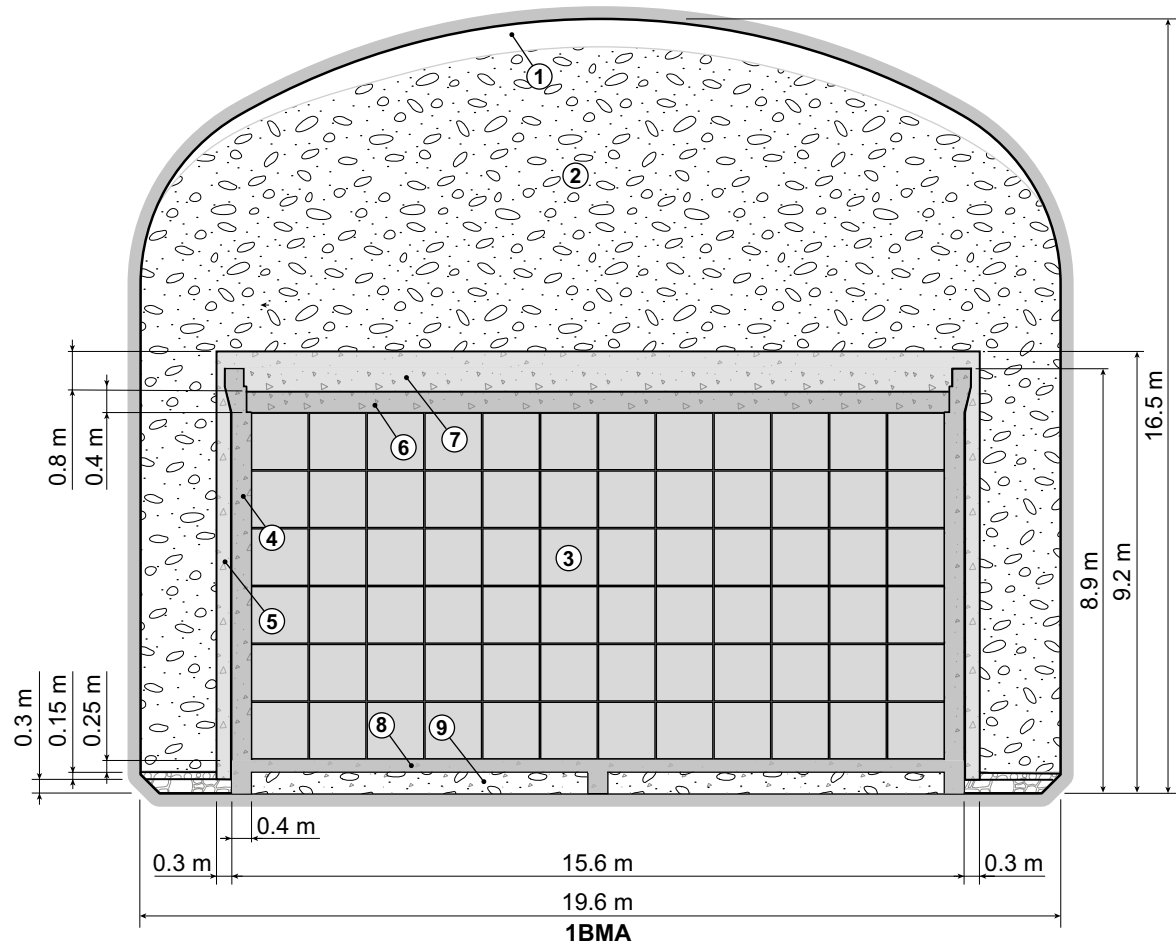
Schematic cross-section of 1BMA at closure. Key to numbering: 1) Void 2) Macadam backfill 3) Waste domain 4) Existing outer wall 5) New outer wall 6) Pre-fabricated concrete element 7) New concrete lid 8) Slab 9) Crushed rock.
